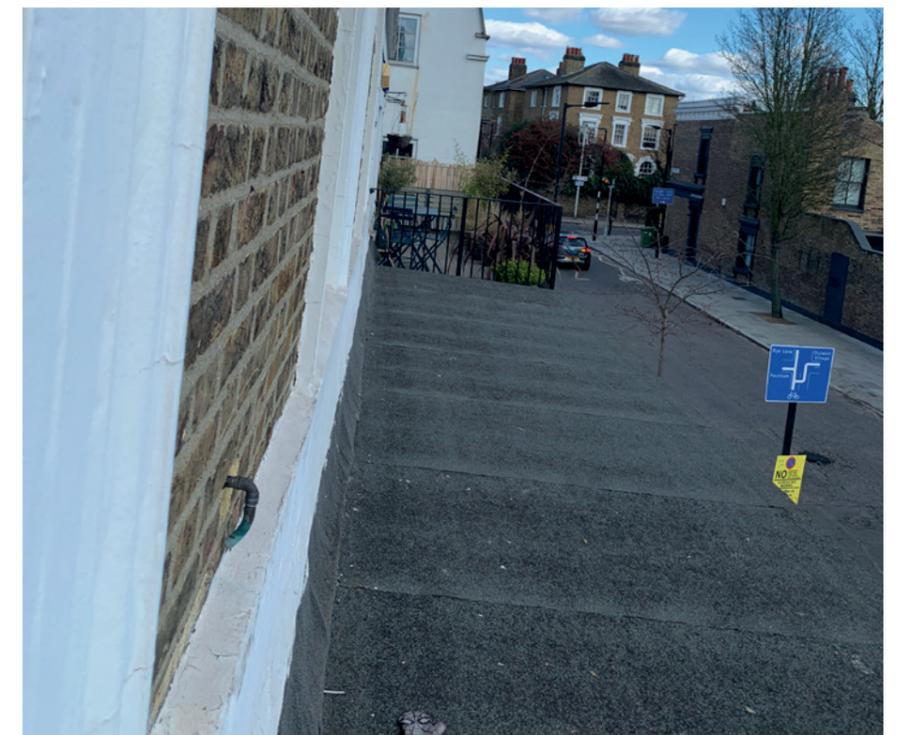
View from window to kitchen and living area looking towards Bellenden Road
